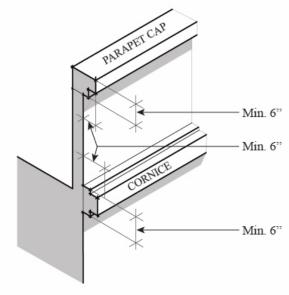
An example of roofs with a parapet cap and a cornice.
